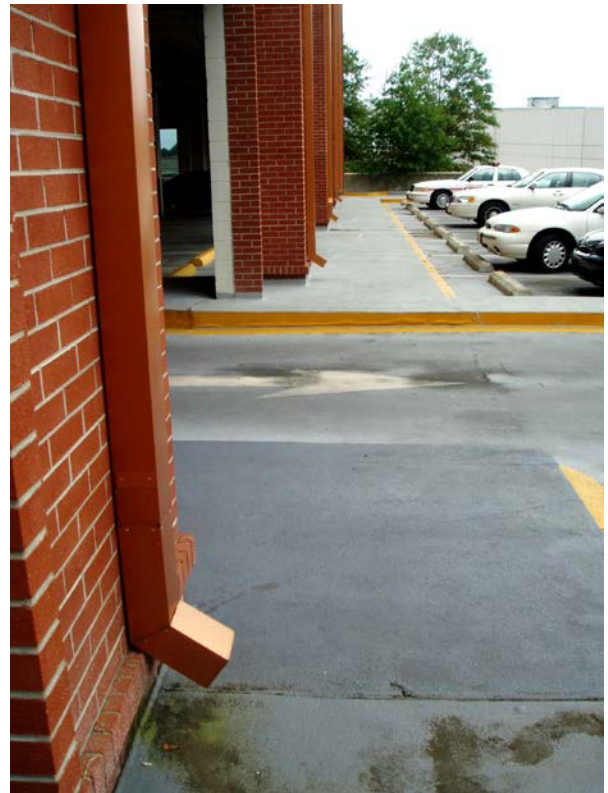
Initial views of test inlet and vicinity before modifications.
